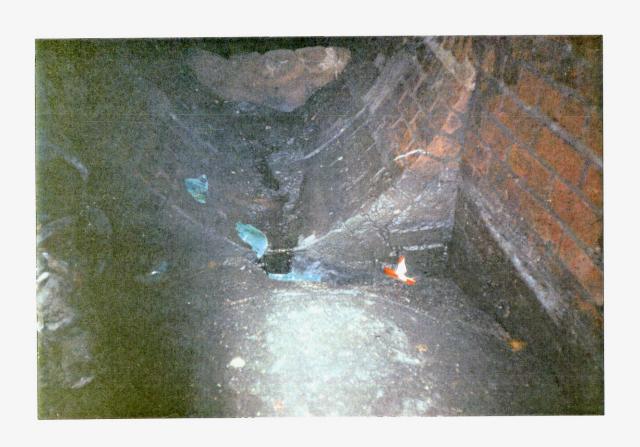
Silt Trap Full of Sediment Prior to Cleaning out
